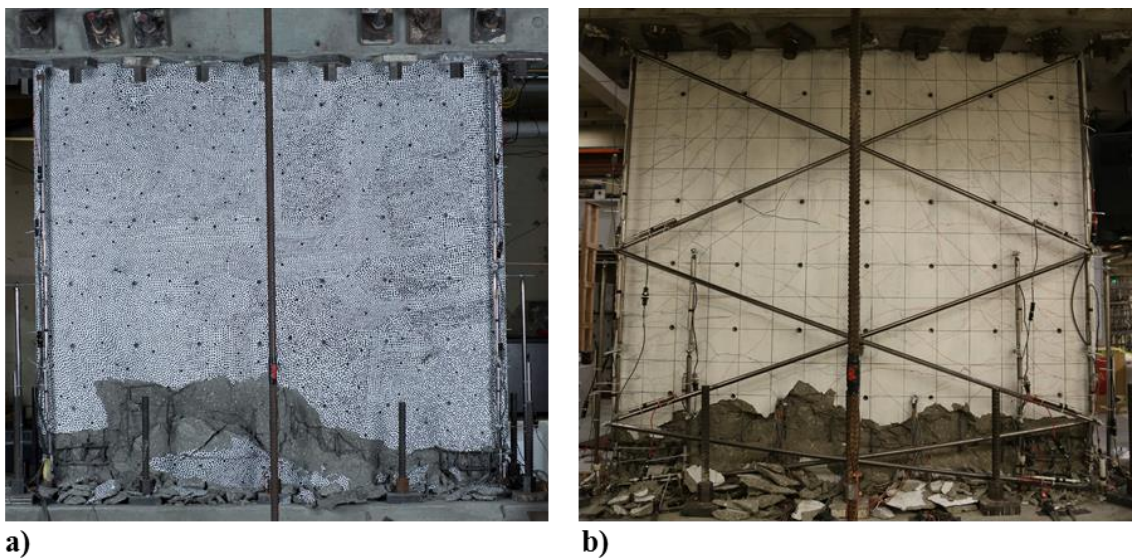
Specimen WP3 – a) Photo of front (south) face of specimen after test; and b) Photo of rear (north) face of specimen after test
